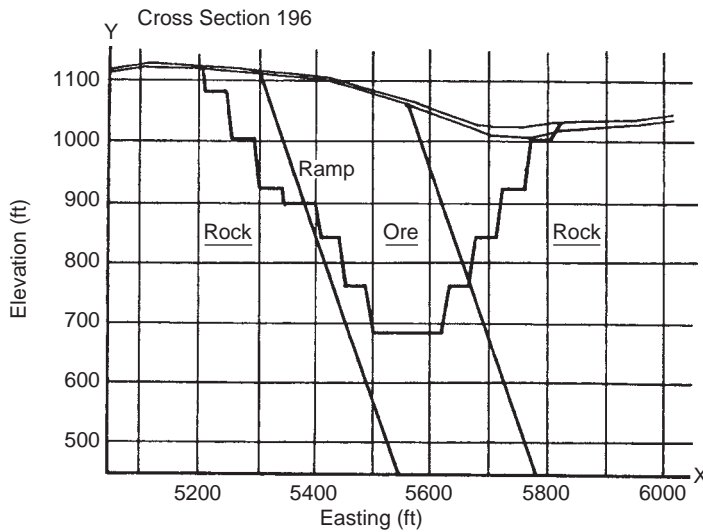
Preliminary pit design for example cross-section (Luke, 1972).
